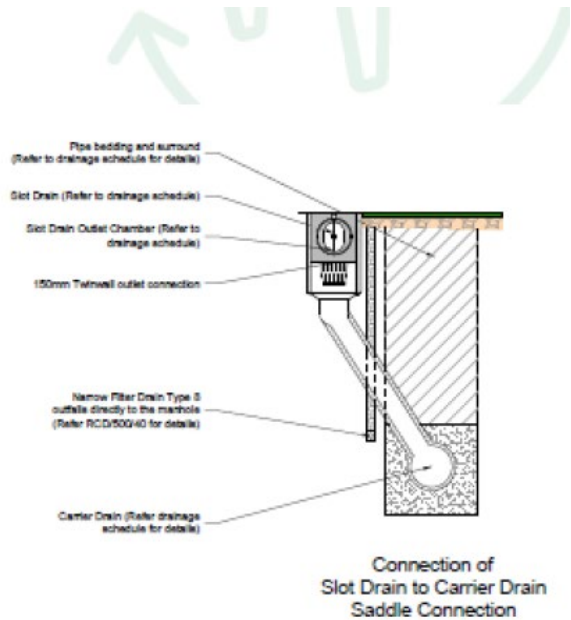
Paved Area Slot Drain at Edge of Runway and Taxiway
